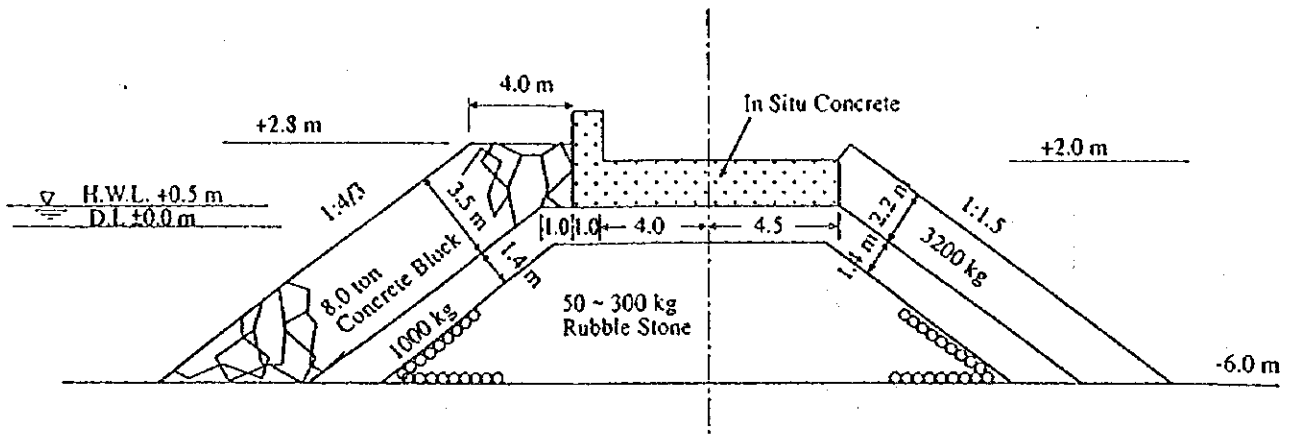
Standard Cross Section of Breakwater Rubble Mound Type (-6.0m)
